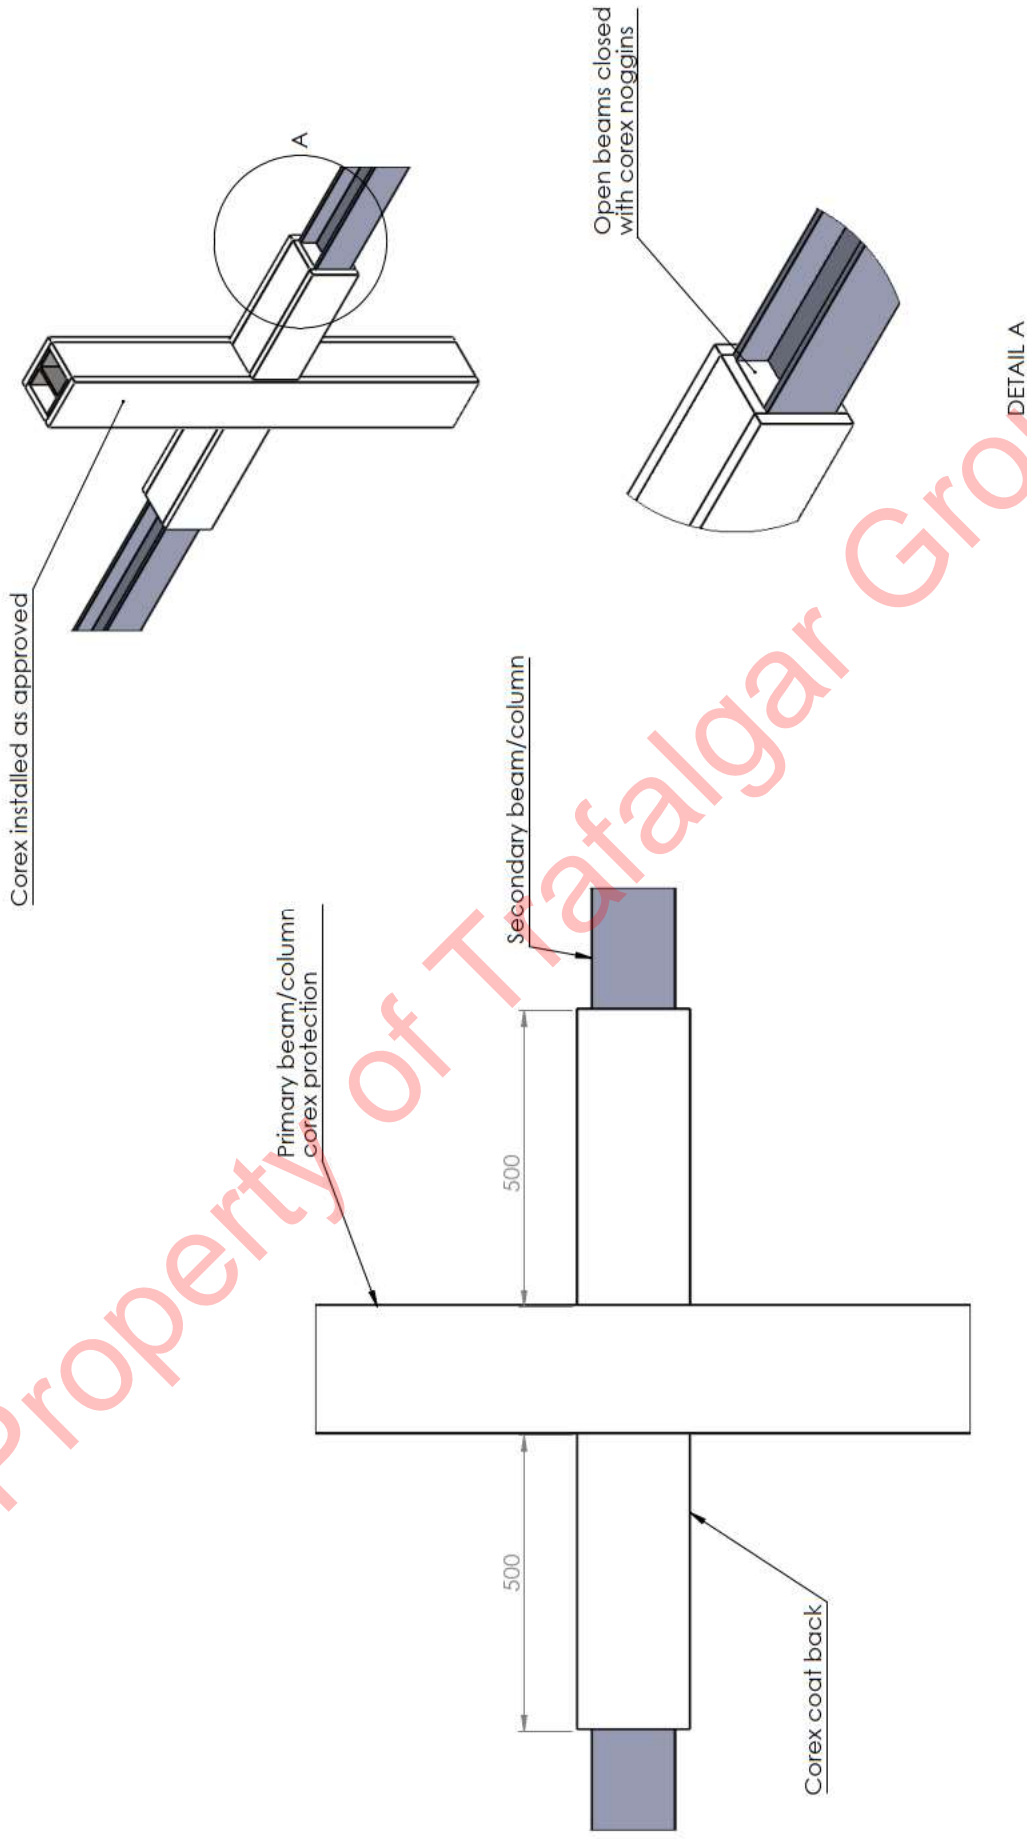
The construction detail of board protection on primary columns and secondary beams for a distance of 500 mm on both sides of the column
